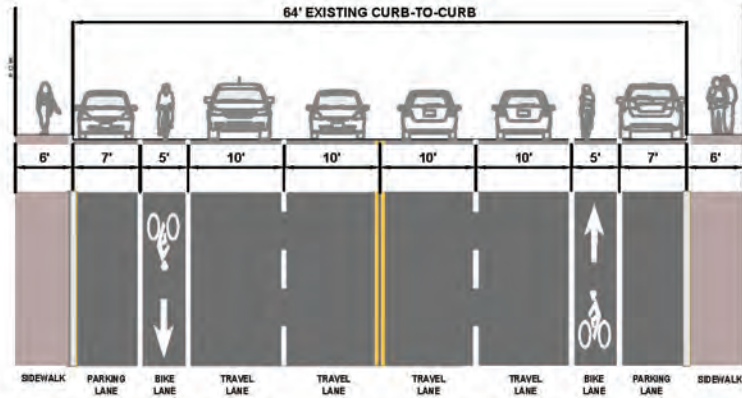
Industrial Road Existing Typical Section A (Facing North)
